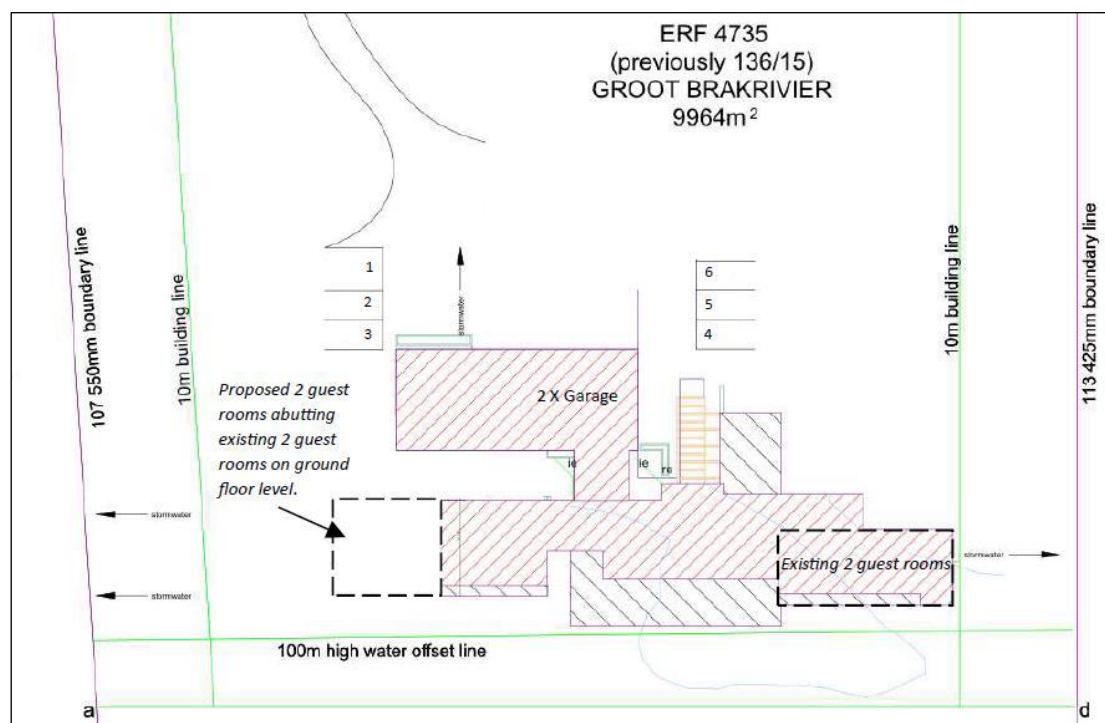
Conceptual Site Development Plan (source: Marlize de Bruyn Planning).
